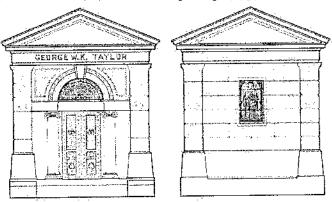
Architectural Drawings of Front and Rear Elevations with Stained Glass Detailing.
